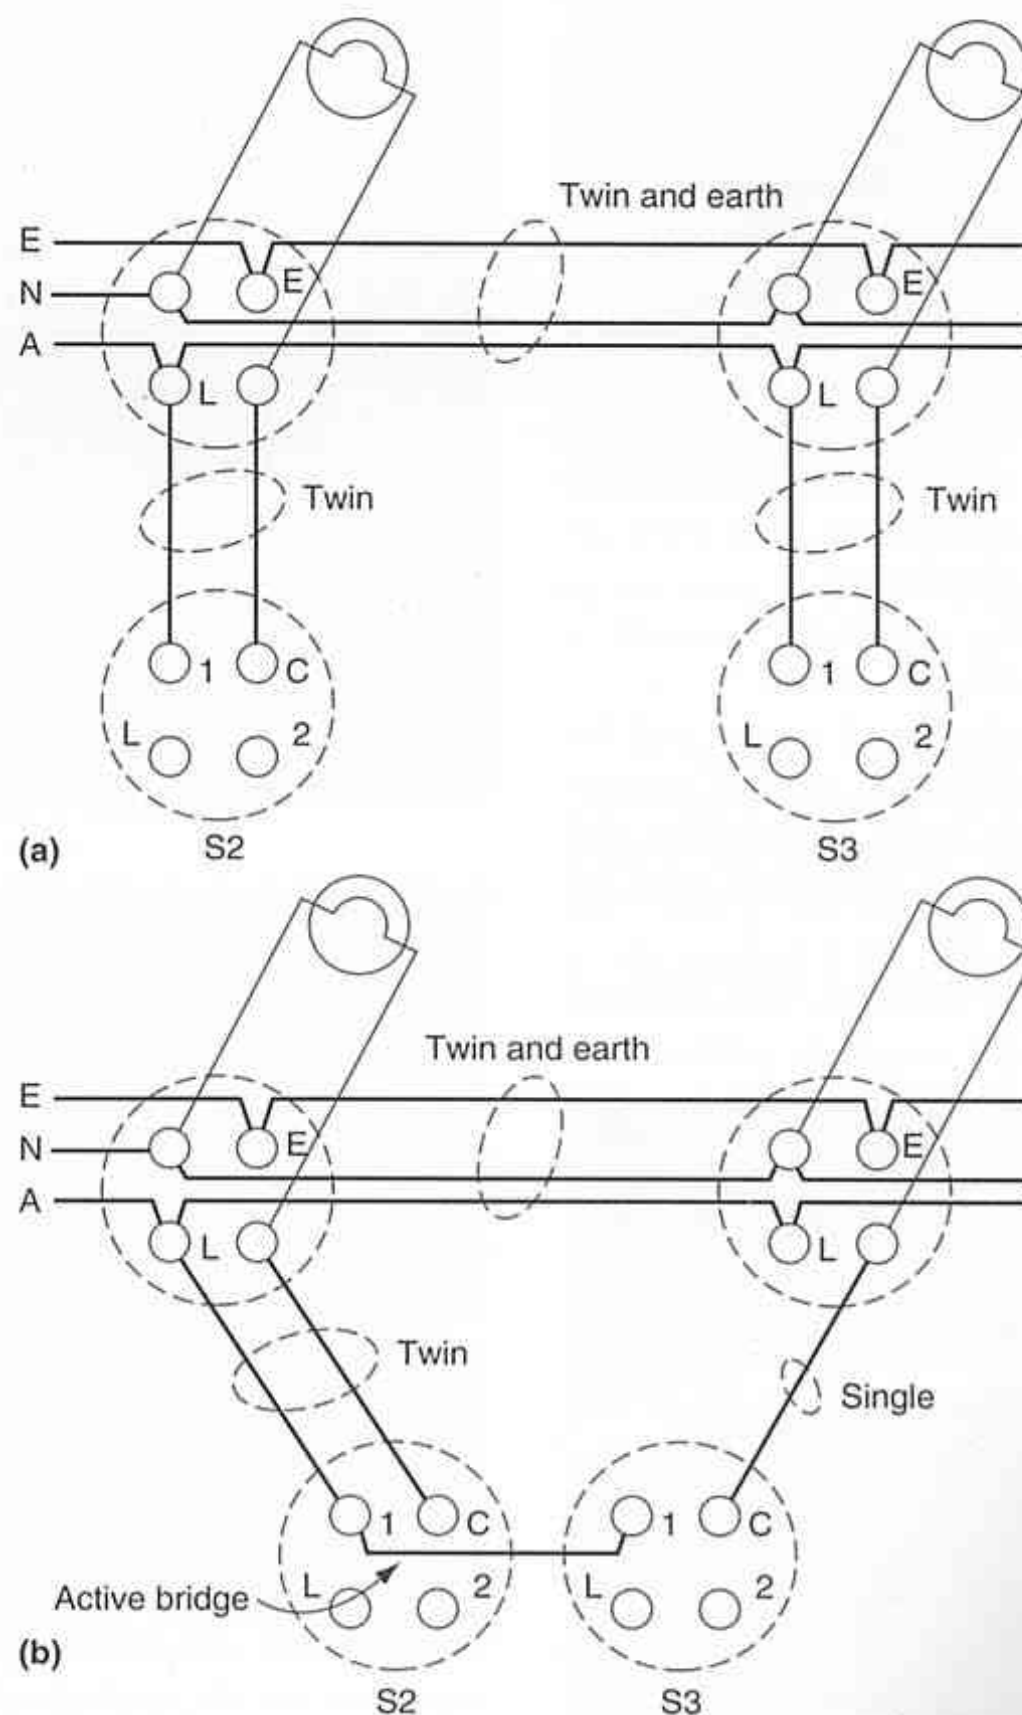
Two methods of wiring using looping at lights: (a) where switches are apart; (b) where switches are adjacent
